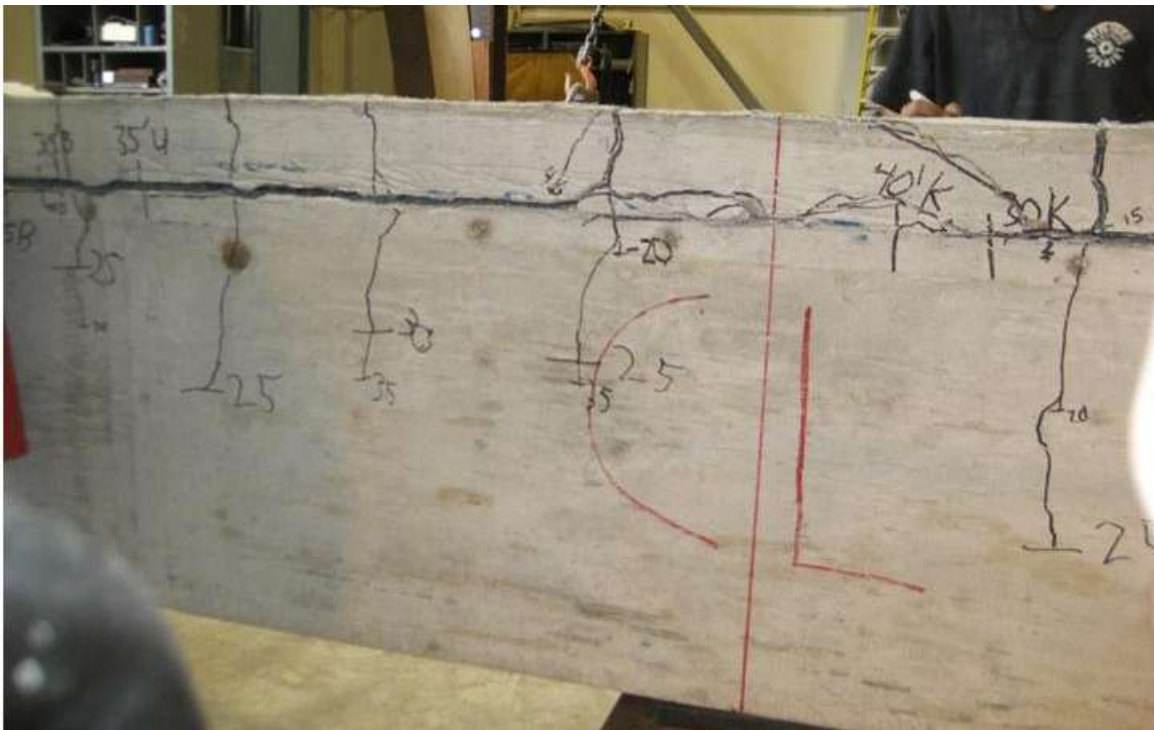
Beam 5, centerline showing separation of concrete, 48-kip end load.
